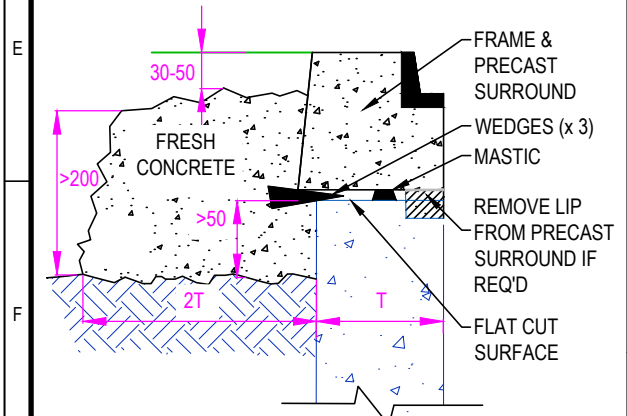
C: PRE-CAST CONSTRUCTION JOINT
